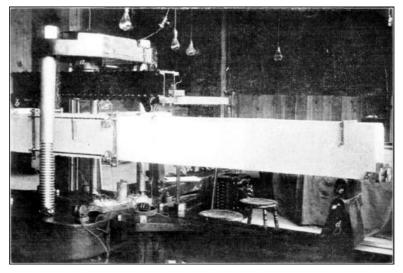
Testing Beam in 200,000-Lb. Machine.
